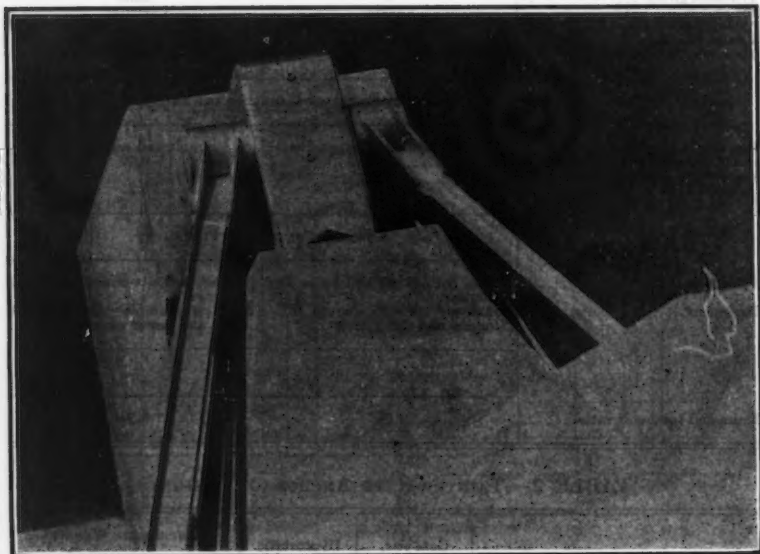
SINGLE-TIE-GIRDER ANCHORAGE
